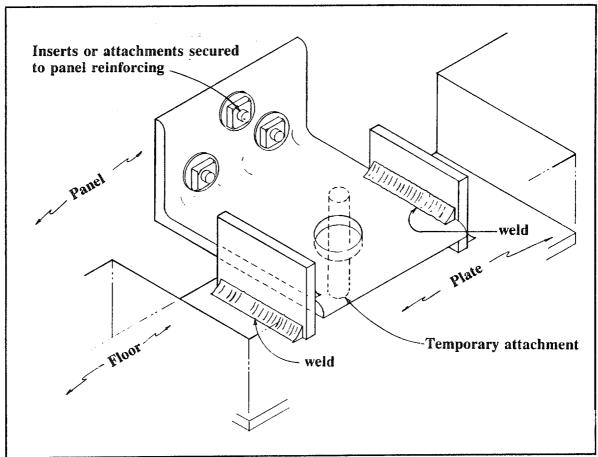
Detail for flexible connection for precast concrete cladding.
